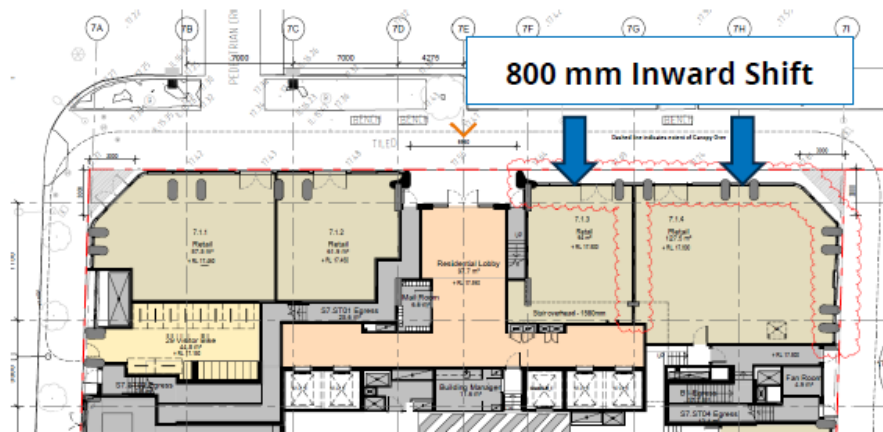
Amended Site 7 facade line fronting Ebsworth Street
